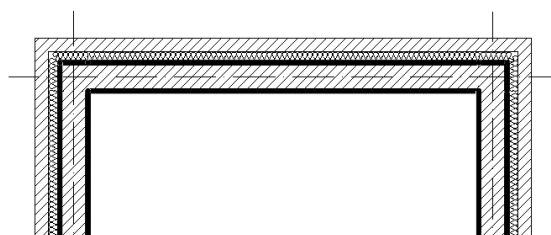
Wall with the pen of line separating the wall load-bearing layer at 0.5 and the line separating the load-bearing layer of the wall at 0.18 (like other pens)
